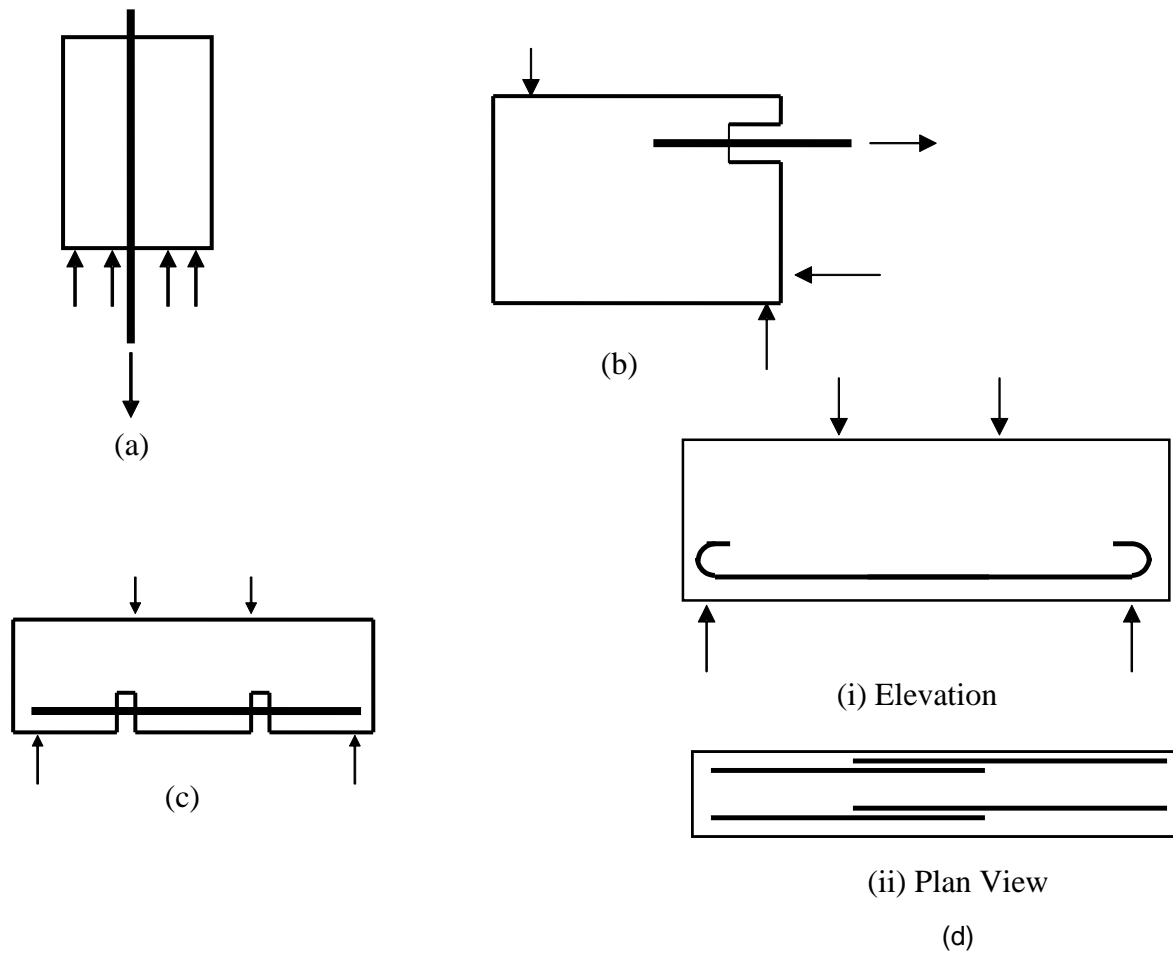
Test Specimens to Evaluate Bond: (a) Pullout Specimen; (b) Beam-End Specimen c) Beam Anchorage Specimen, and d) Splice Specimen (after ACI Committee 408, 2003)
